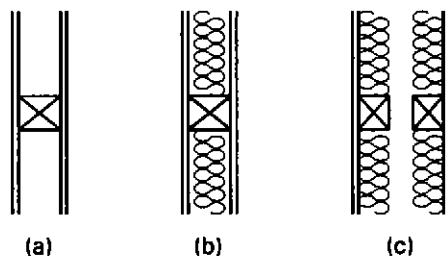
Section through (a) a simple lightweight wall, (b) a simple wall with absorption and (c) a wall with each leaf attached to a separate frame.
